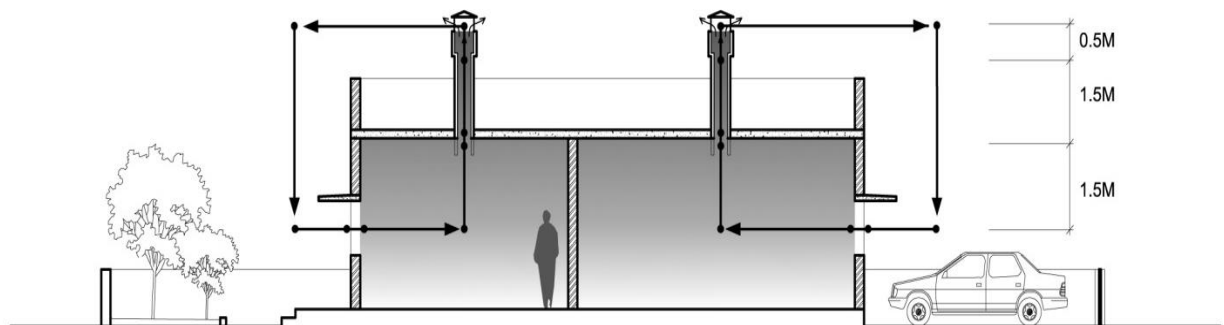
SECTION BB' THROUGH DINING ROOM AND KITCHEN – CASE (A)
